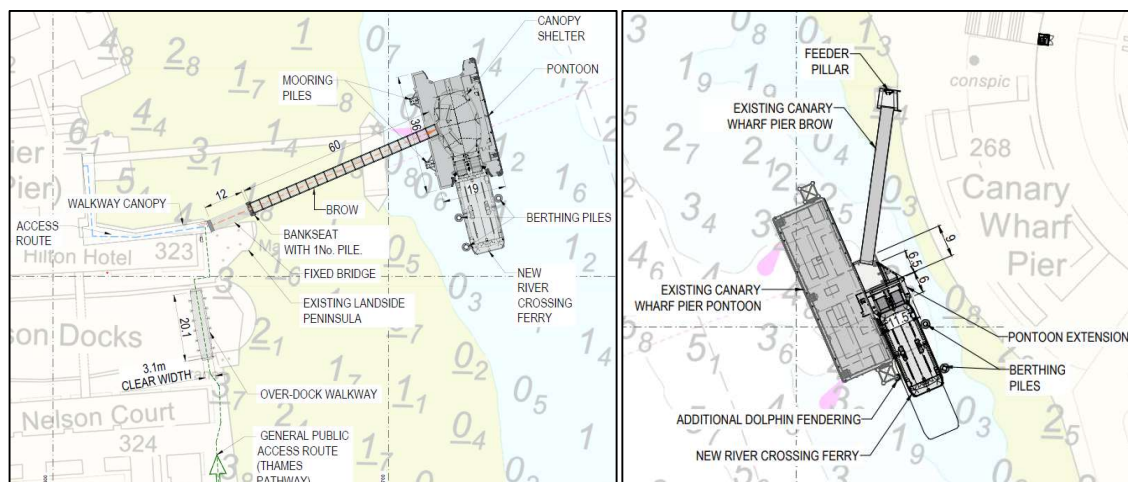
General arrangement plans for the new Rotherhithe Pier (left) and extended Canary Wharf Pier (right).
